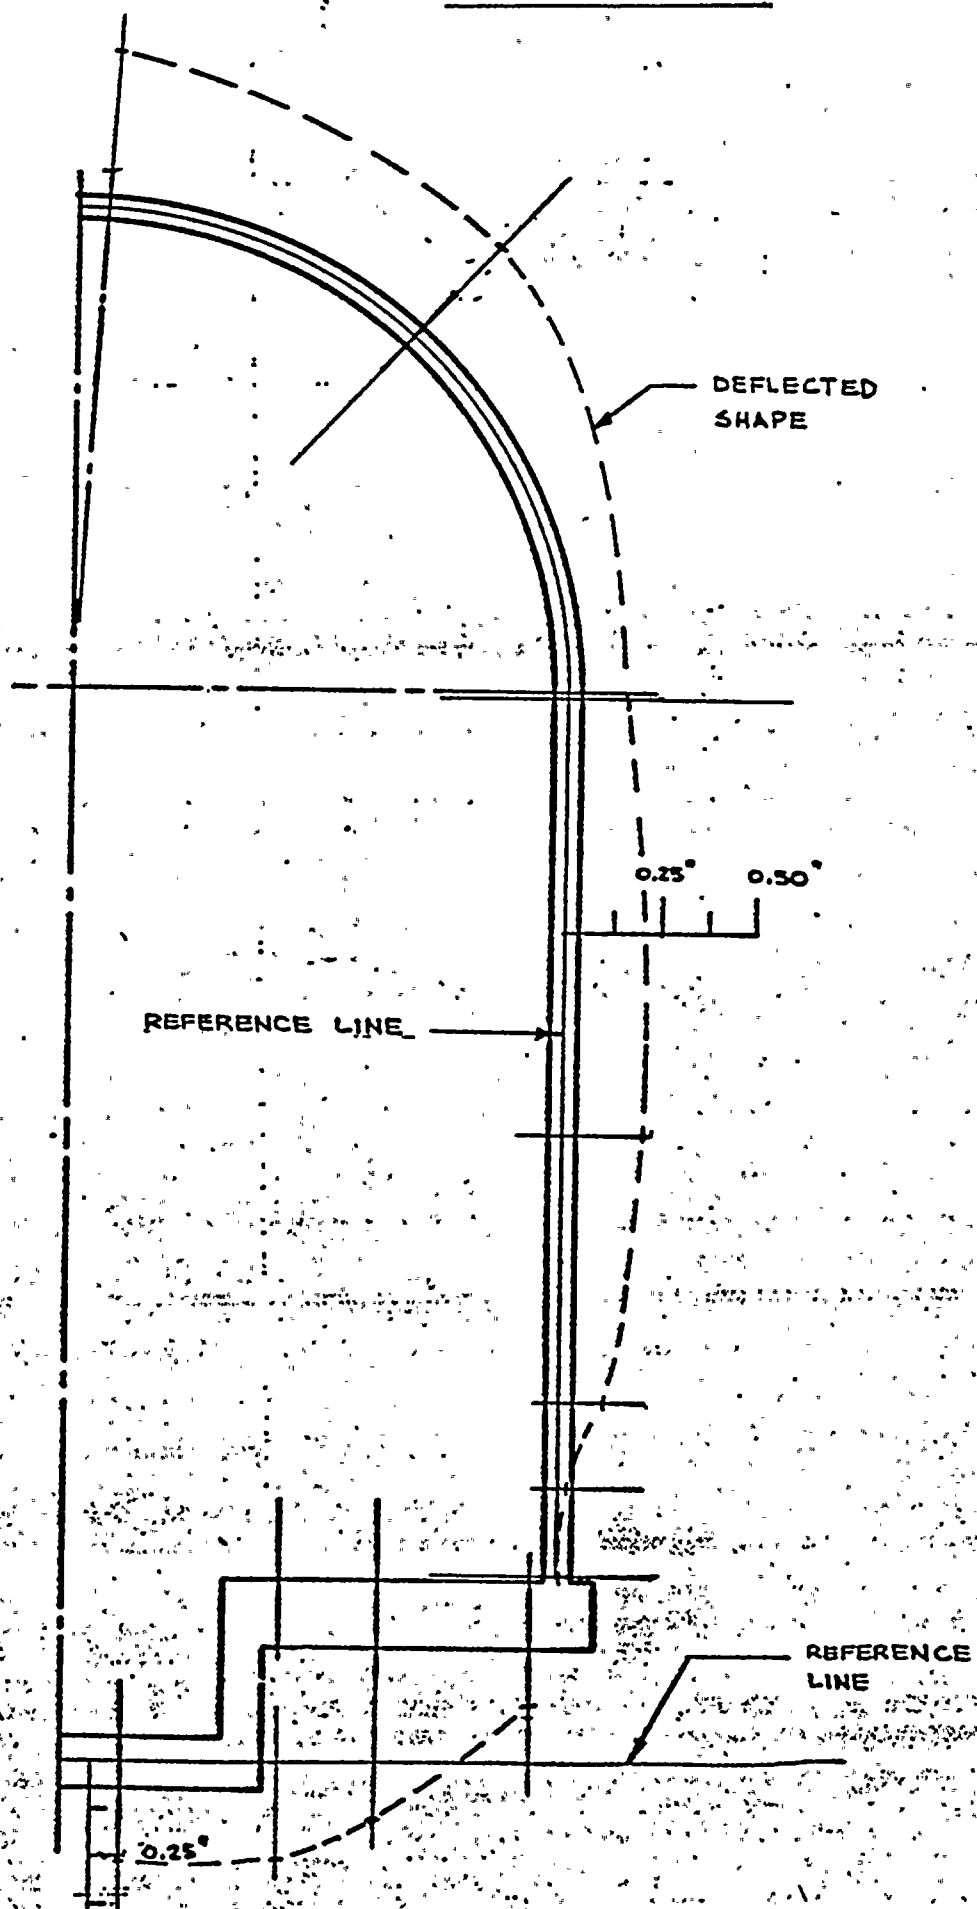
DEVELOPED ELEVATION OF MATHEMATICAL MODEL OF EQUIPMENT HATCH OPENING
